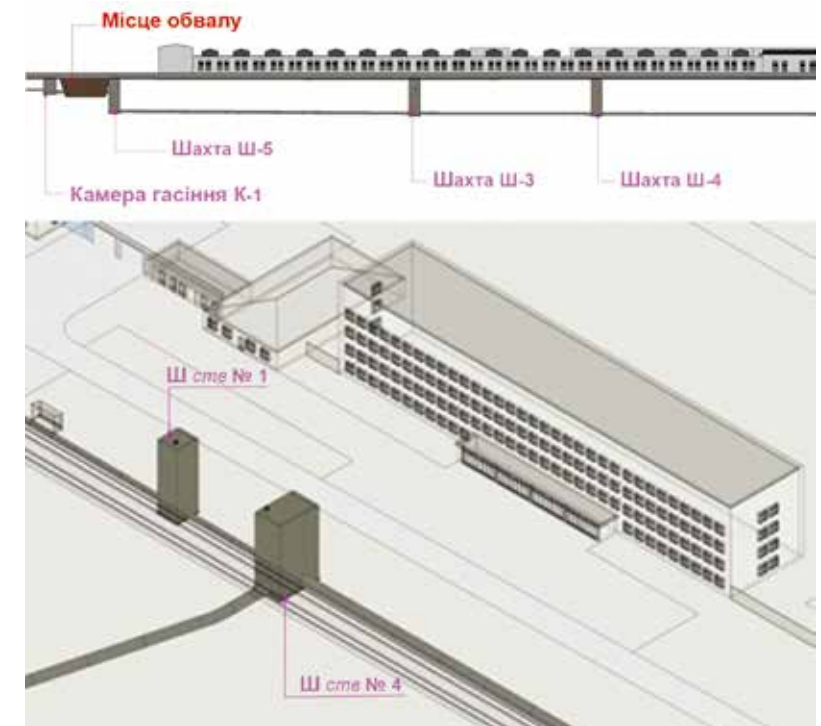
3D sections of the modeled site near the KhtZ plant
